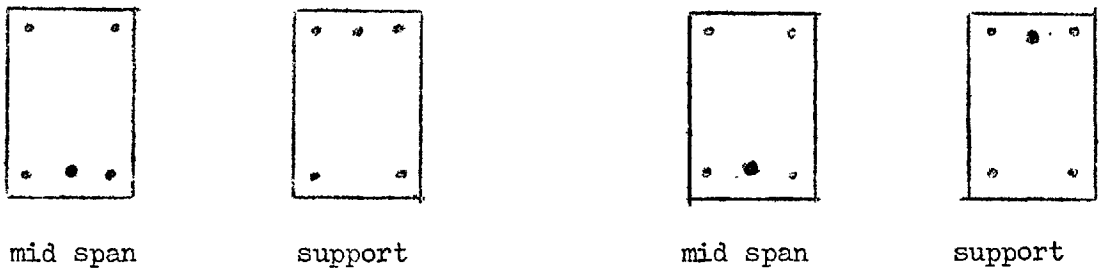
(a). Main Reinforcement Details of Continuous Beams
